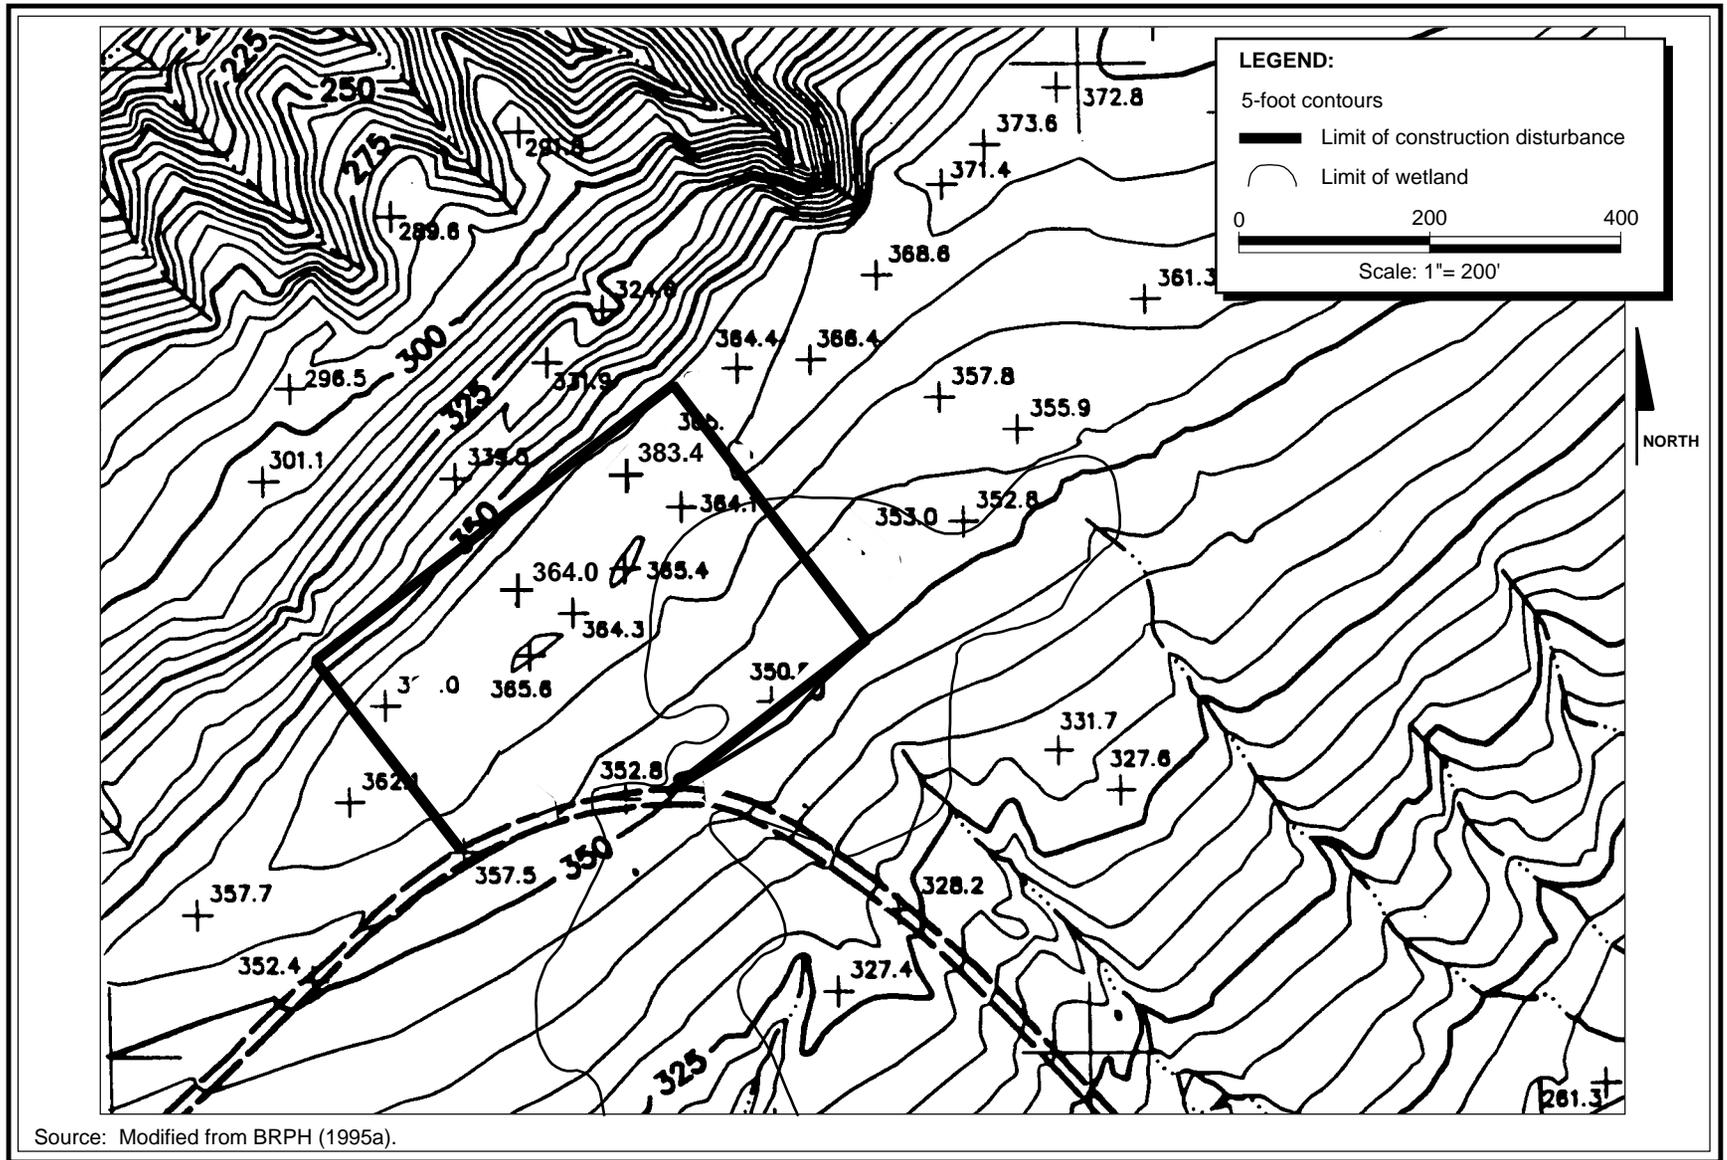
Proposed Launch Control and Management Center site location.
